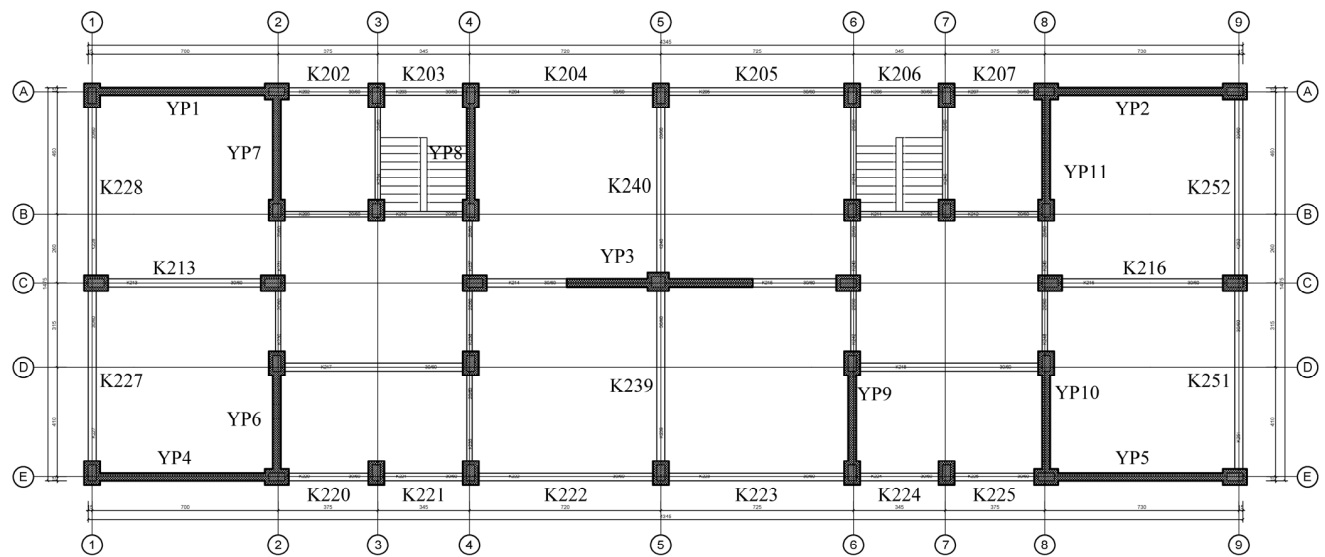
The structural layout of the +6.40 level slab, featuring jacketed columns and added shear walls for strengthening between frame columns.
